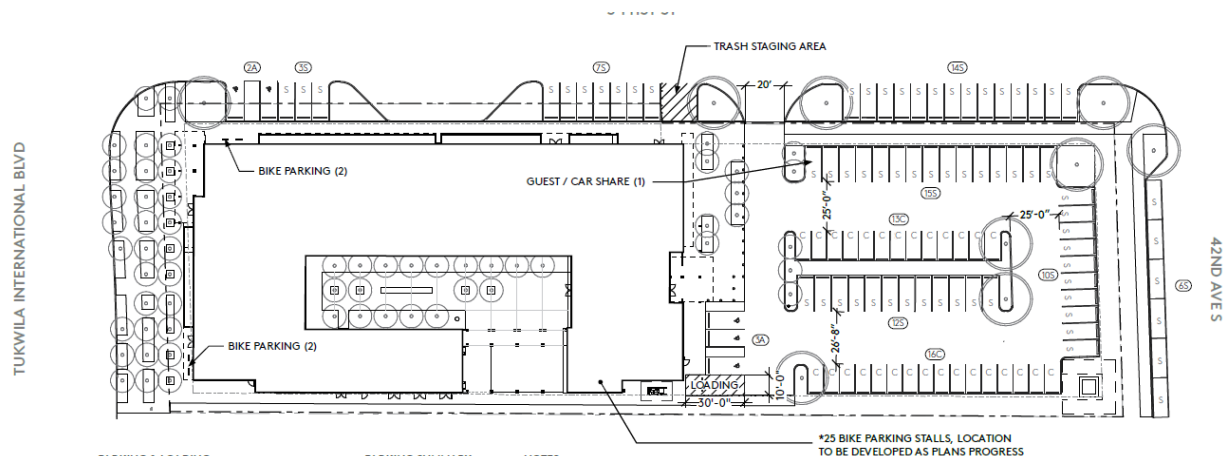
Forterra's Initial Site Plan and Parking Layout.
